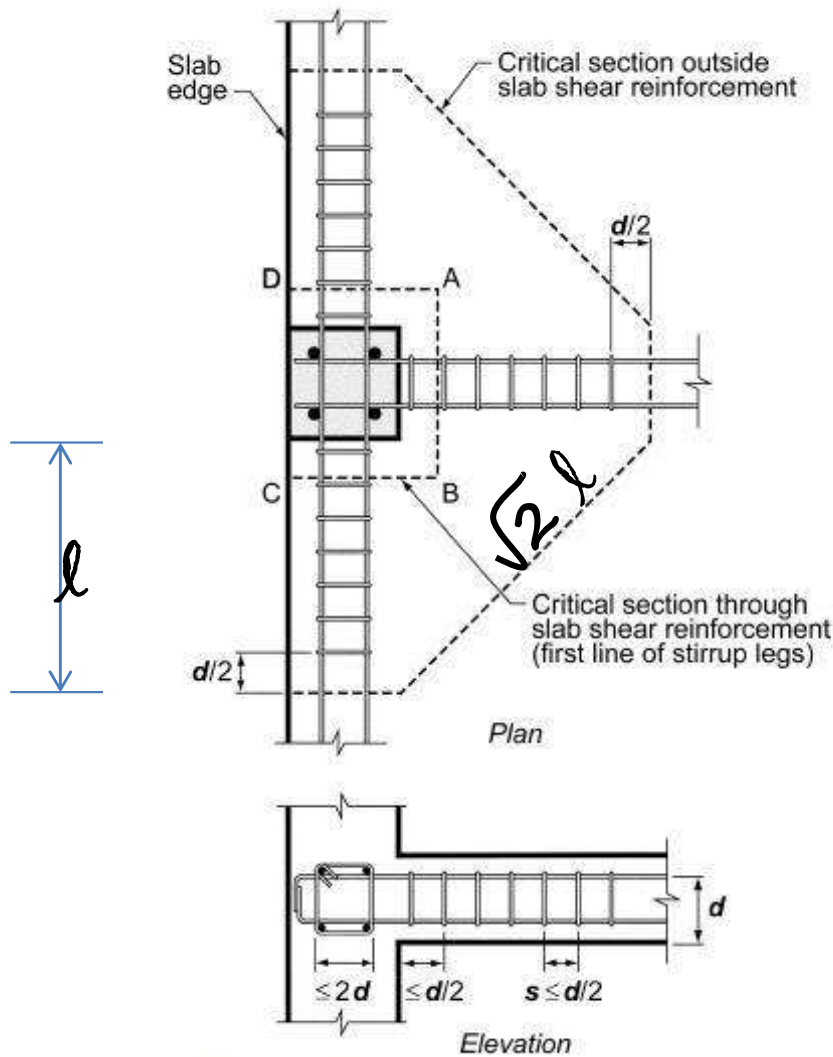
Arrangement of stirrup shear reinforcement, edge column.
